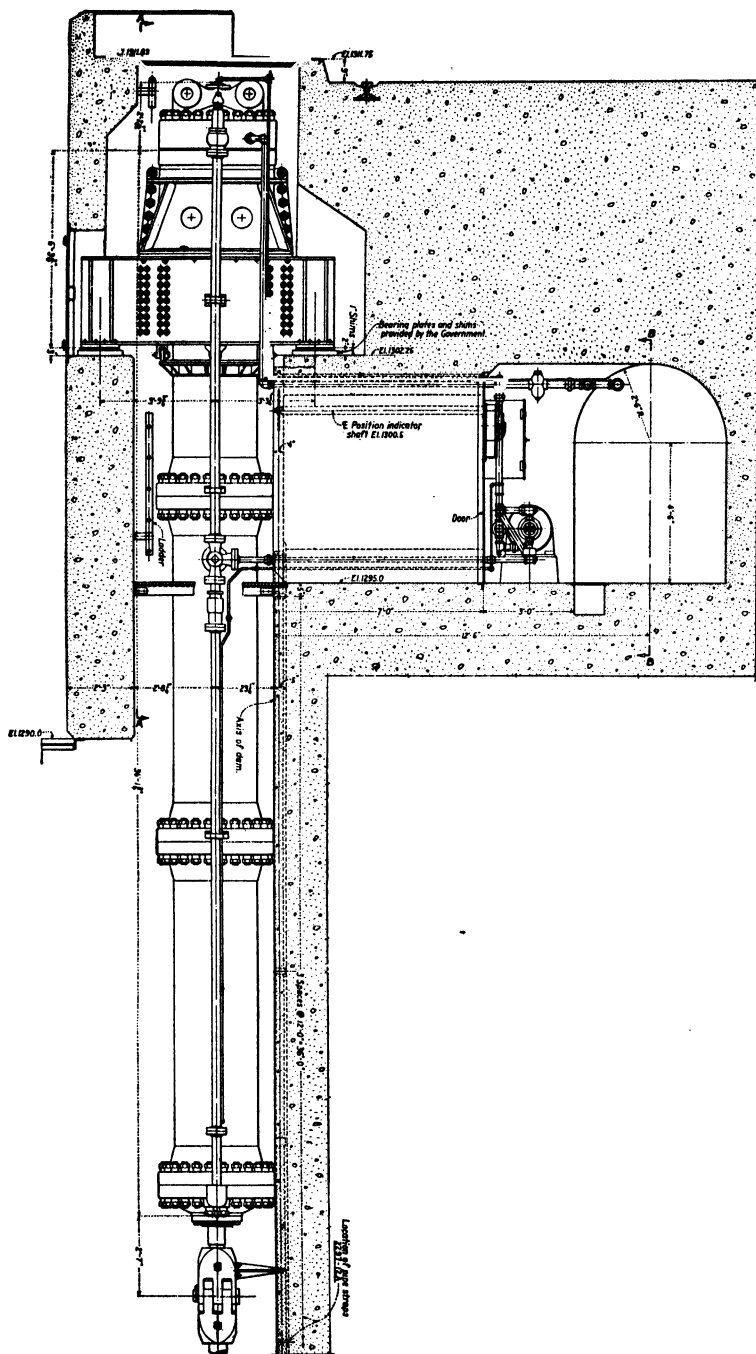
15 by 29.65-ft penstock coaster-gate hoist. General installation at Grand Coulee Dam.
